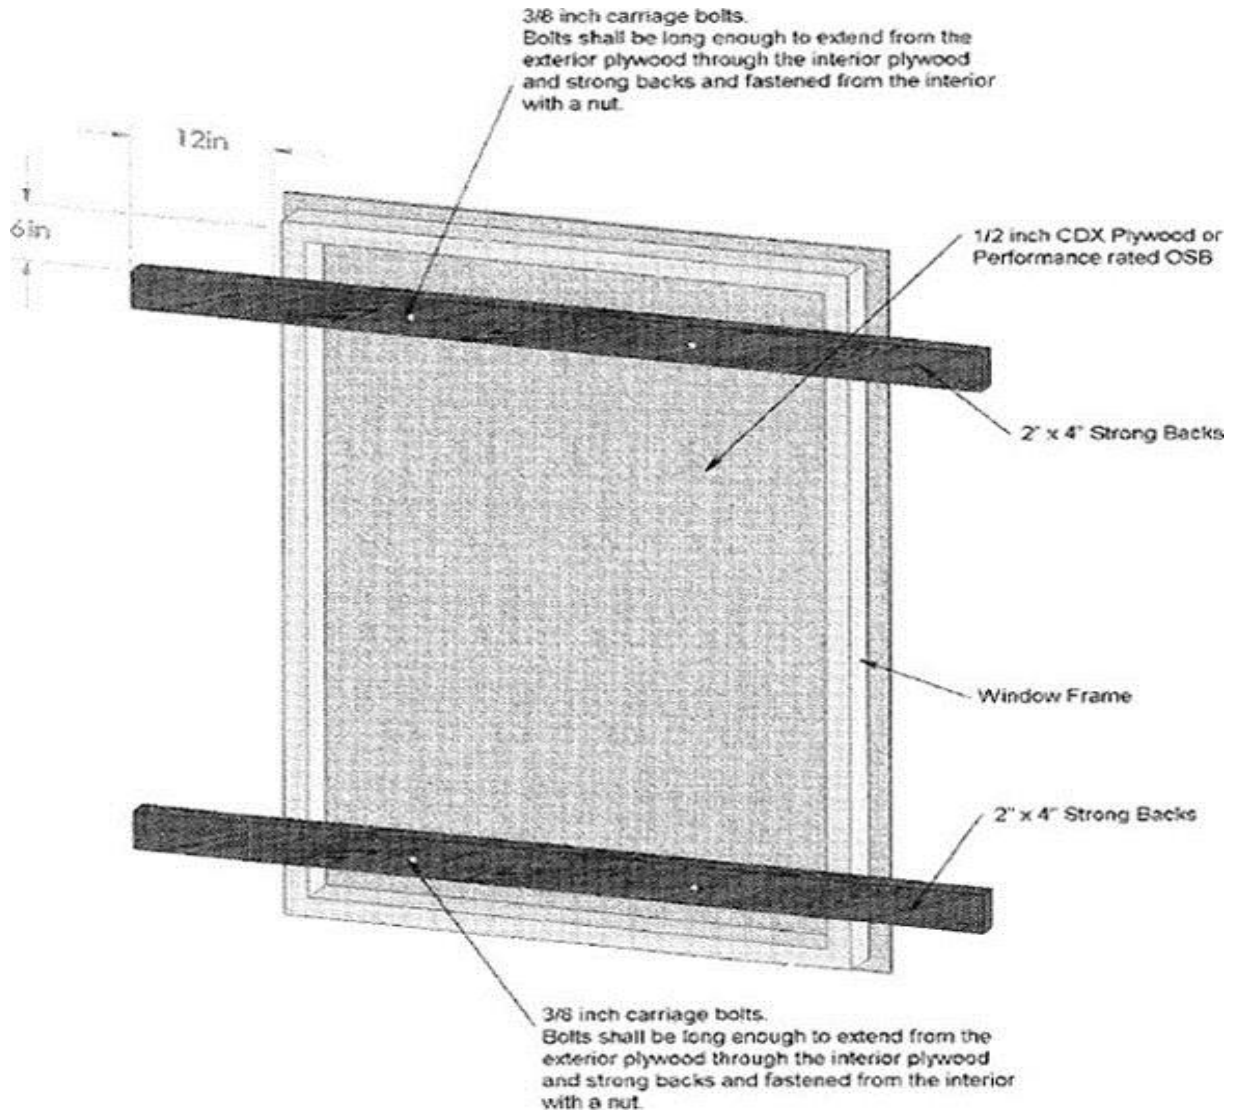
(1) BOARDING OF DOOR OR WINDOW
